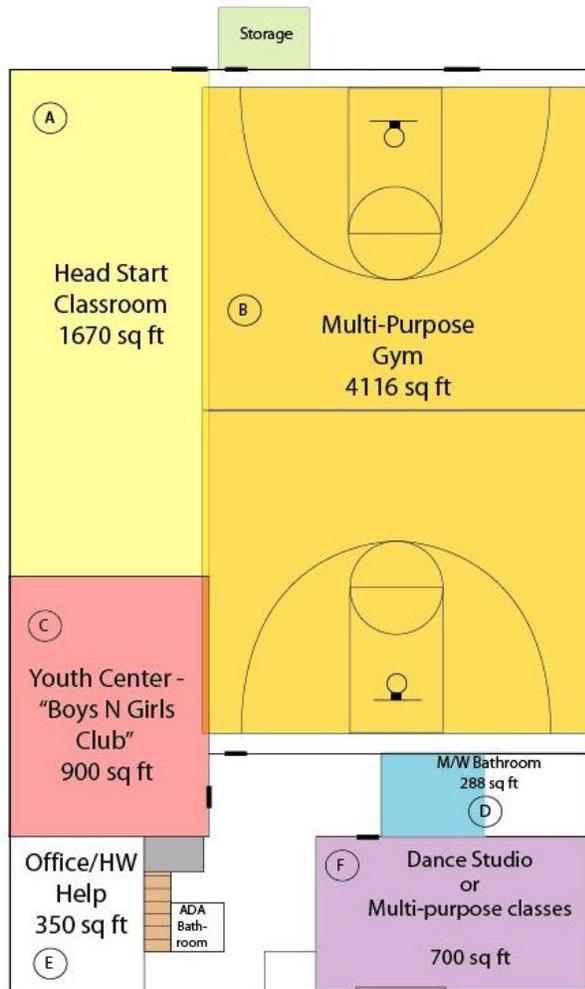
Cobalt Building Conceptual Floor Plan - Option #1 (Recommended)
